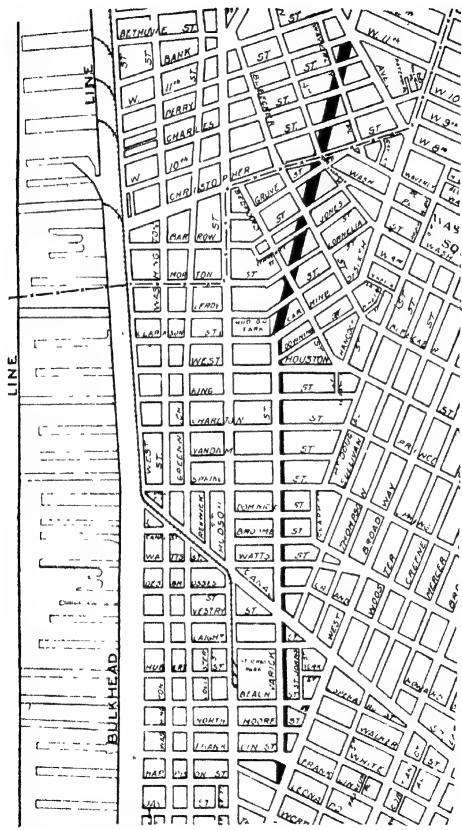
Showing the cutting through of a new street and the widening of an existing street to form a traffic artery 100 ft. wide in New York.
